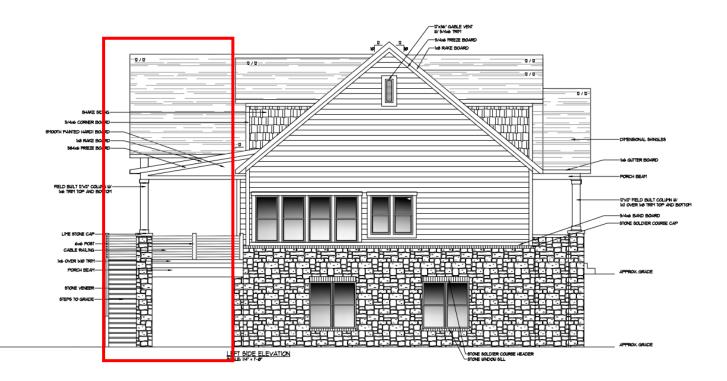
Construction plans for side view of home (lakeside porch on the left)
